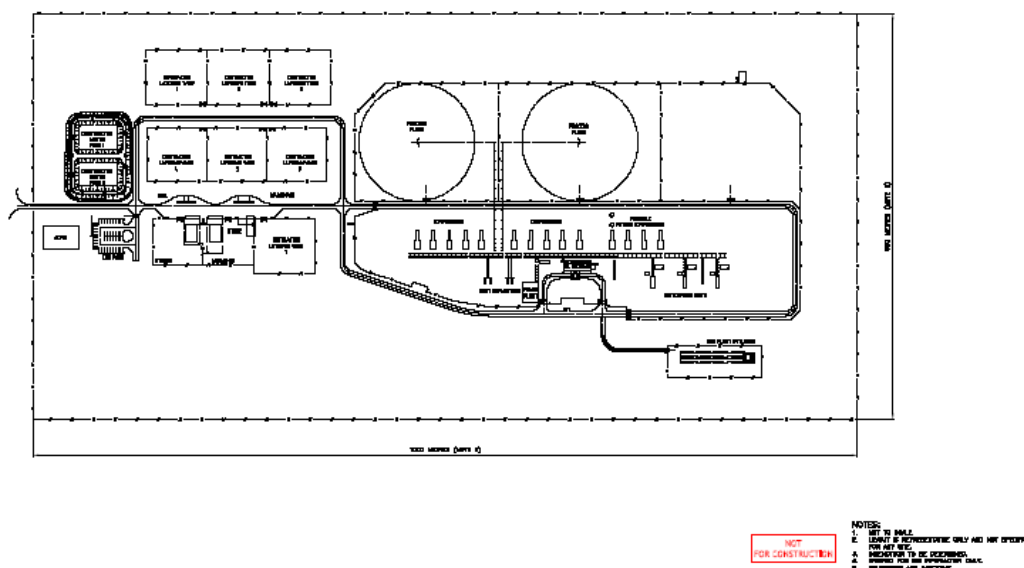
Gas processing facility concept layout (Source: Australia Pacific LNG)
